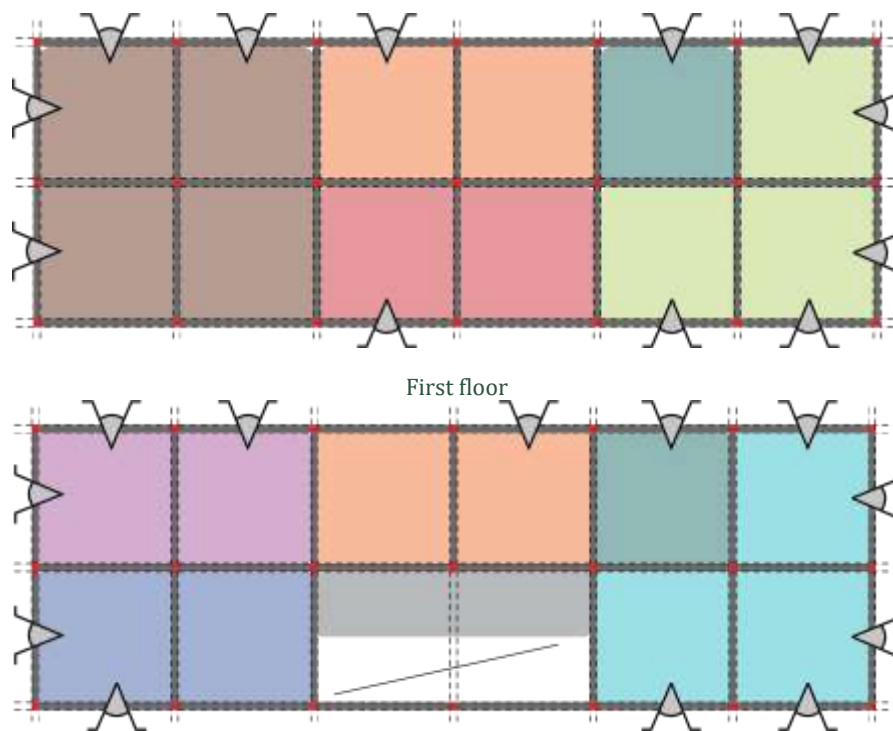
Functional schematic plans of the New Building. Source: UNITN
